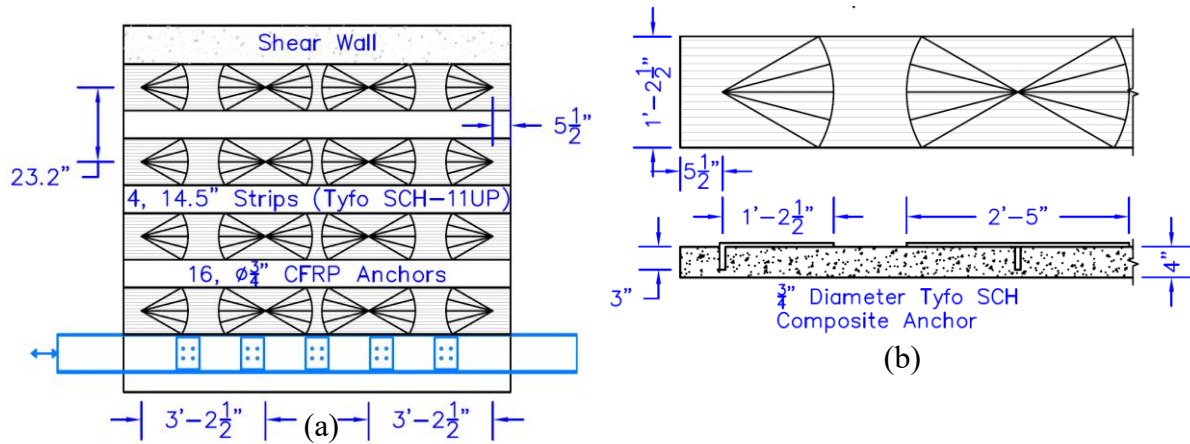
Retrofit of Specimen CD3: (a) Plan View of Retrofit; (b) Anchor Details.
